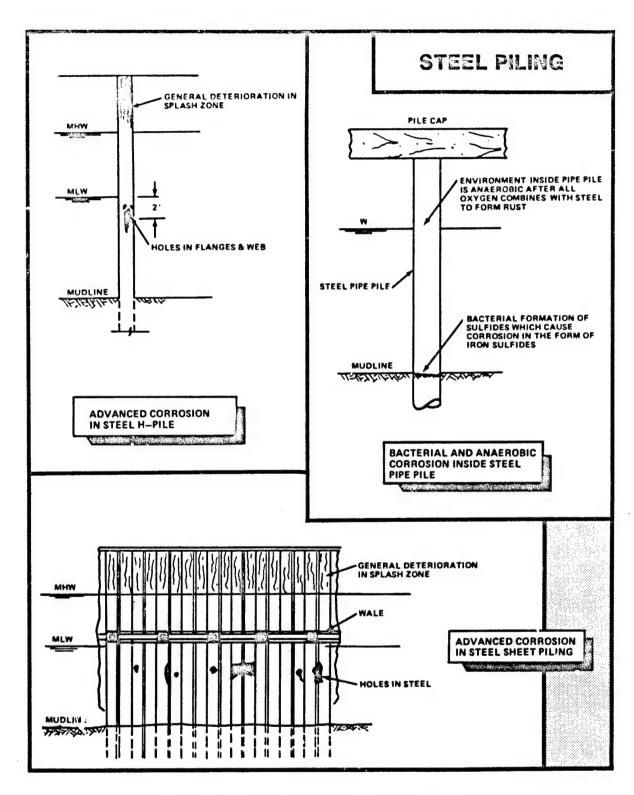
Typical Corrosion Damage to Steel Bearing and Sheet Piling.
